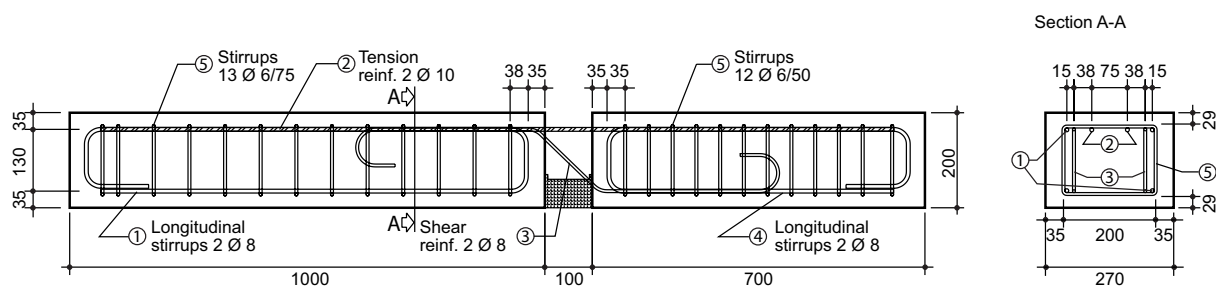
Reinforcement and dimensions of the hybrid GFRP/steel experimental beams
